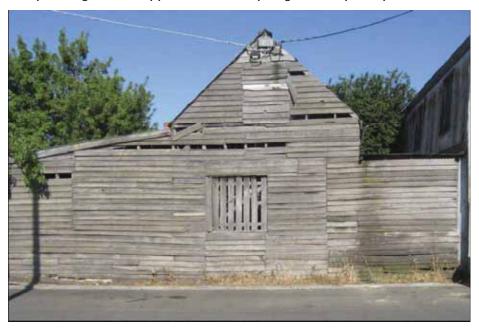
A timber outbuilding remains on the east boundary, which is an early stable (date not confirmed). It has a gabled roof with a filled in opening in the gable end, and another one below, and skillion additions off the long elevations.
